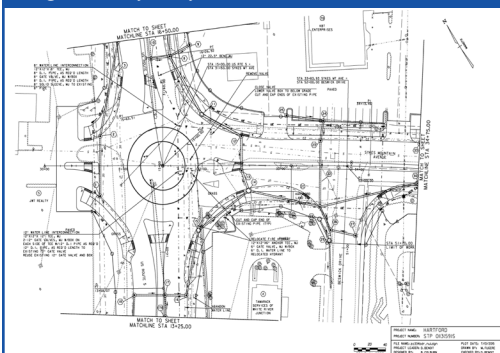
SYKES MOUNTAIN AVE ROUNDBABOUT SITE PLANS
